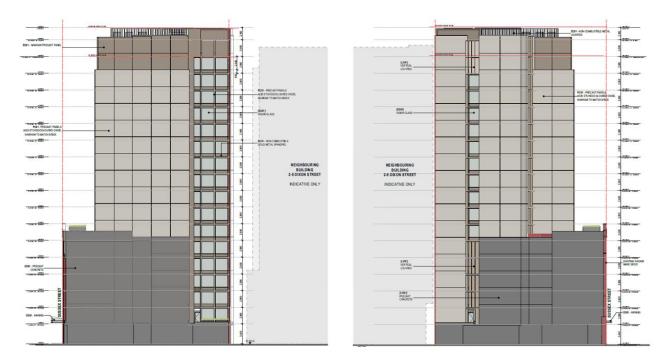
Original Scheme (11 May 2022), Proposed North Elevation (left) and South Elevation (right)
